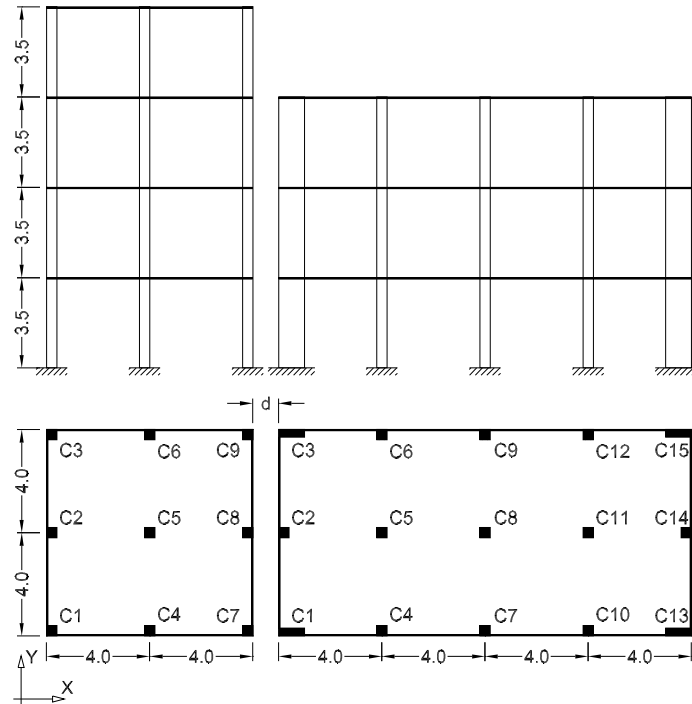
The side views and floor plans of the buildings considered in the presented example.
